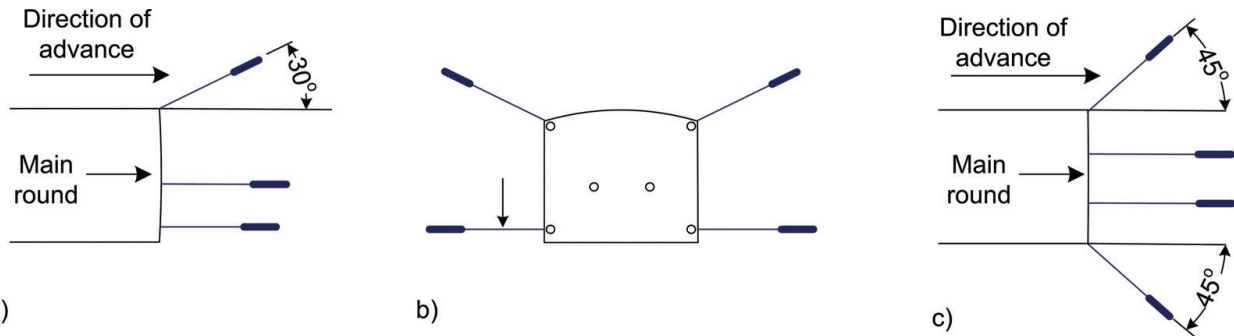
Typical preconditioning pattern in drift developments (Sainoki et al., 2017) – a) Longitudinal view, b) section view, c) Plan view.
